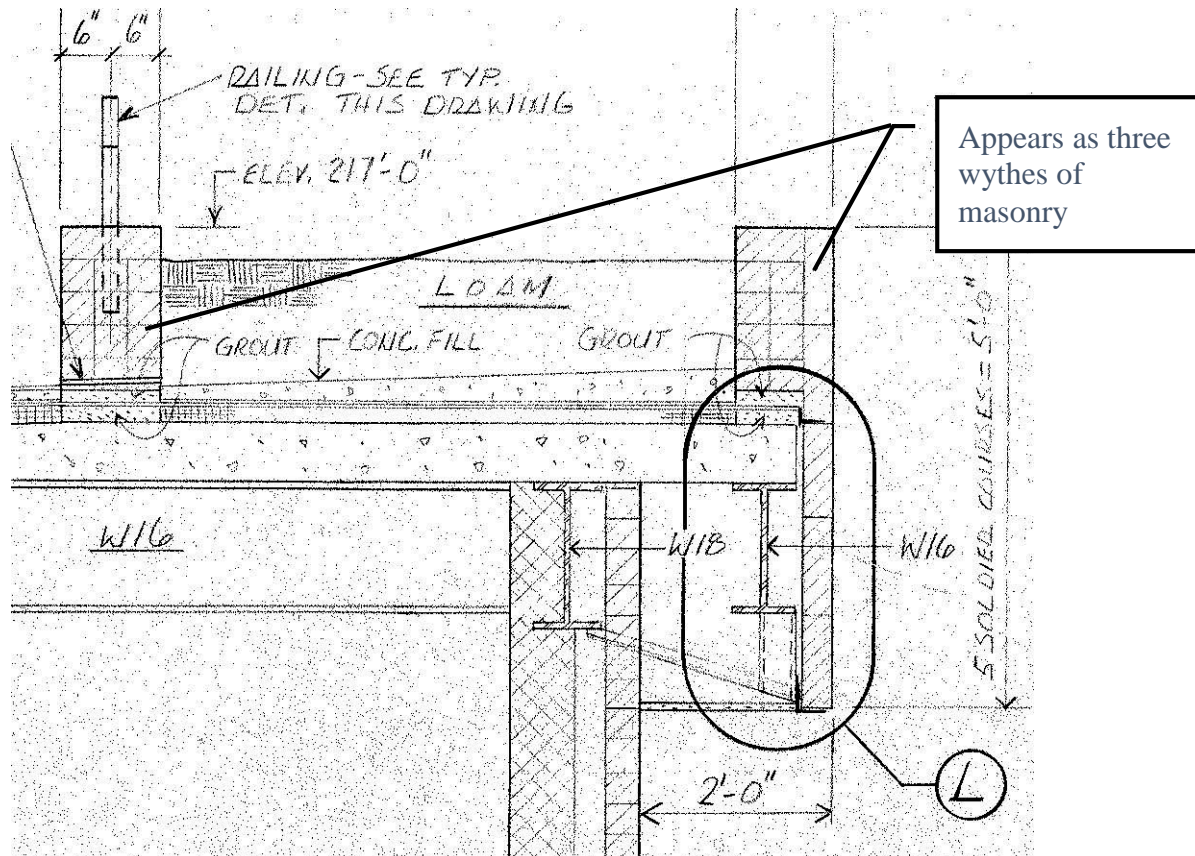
Image F – original design drawing with industry standard brick masonry unit hatching within the planter walls.
